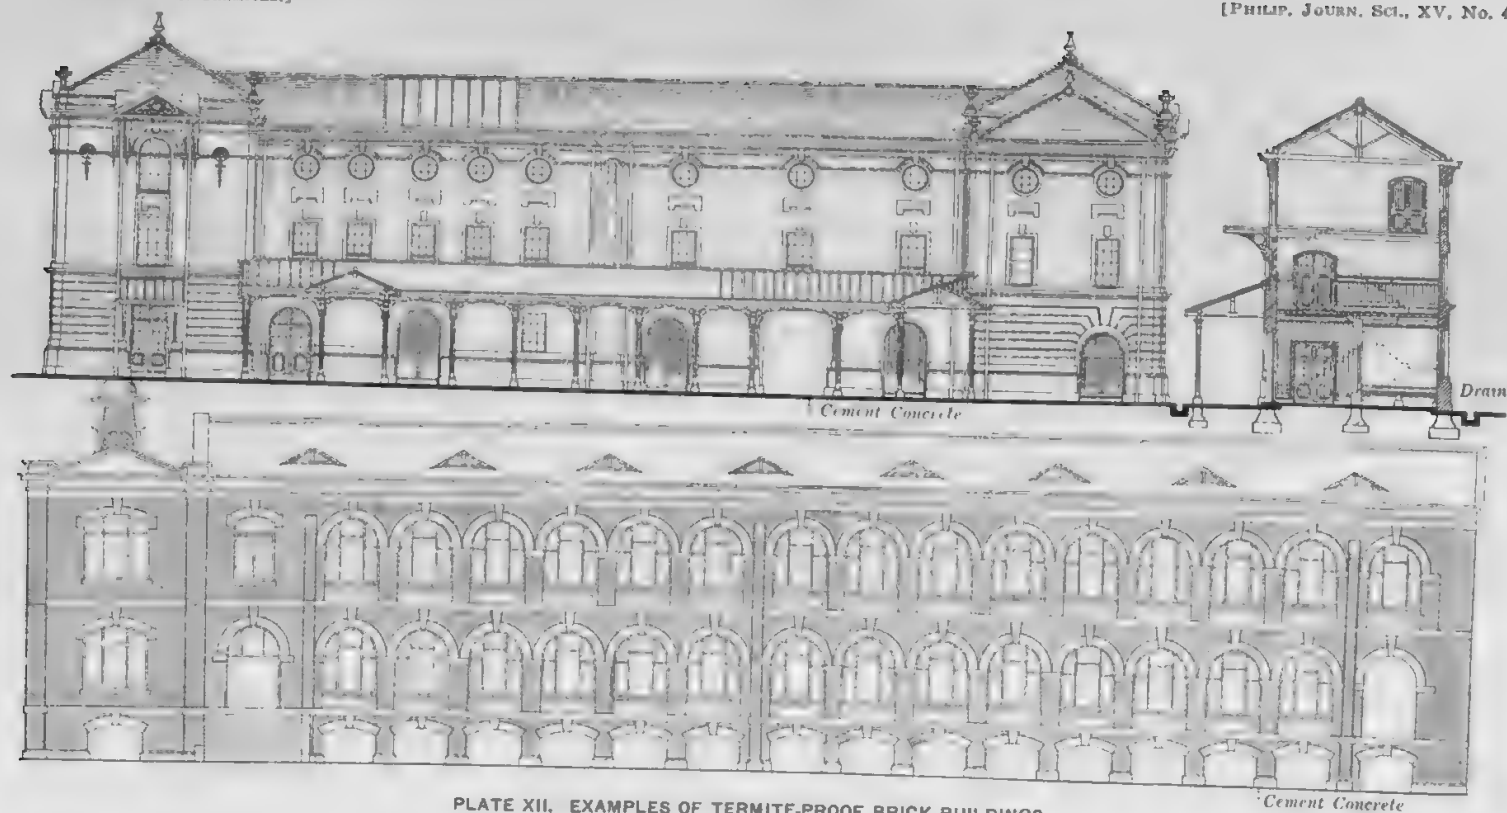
PLATE XII. EXAMPLES OF TERMITE-PROOF BRICK BUILDINGS.
